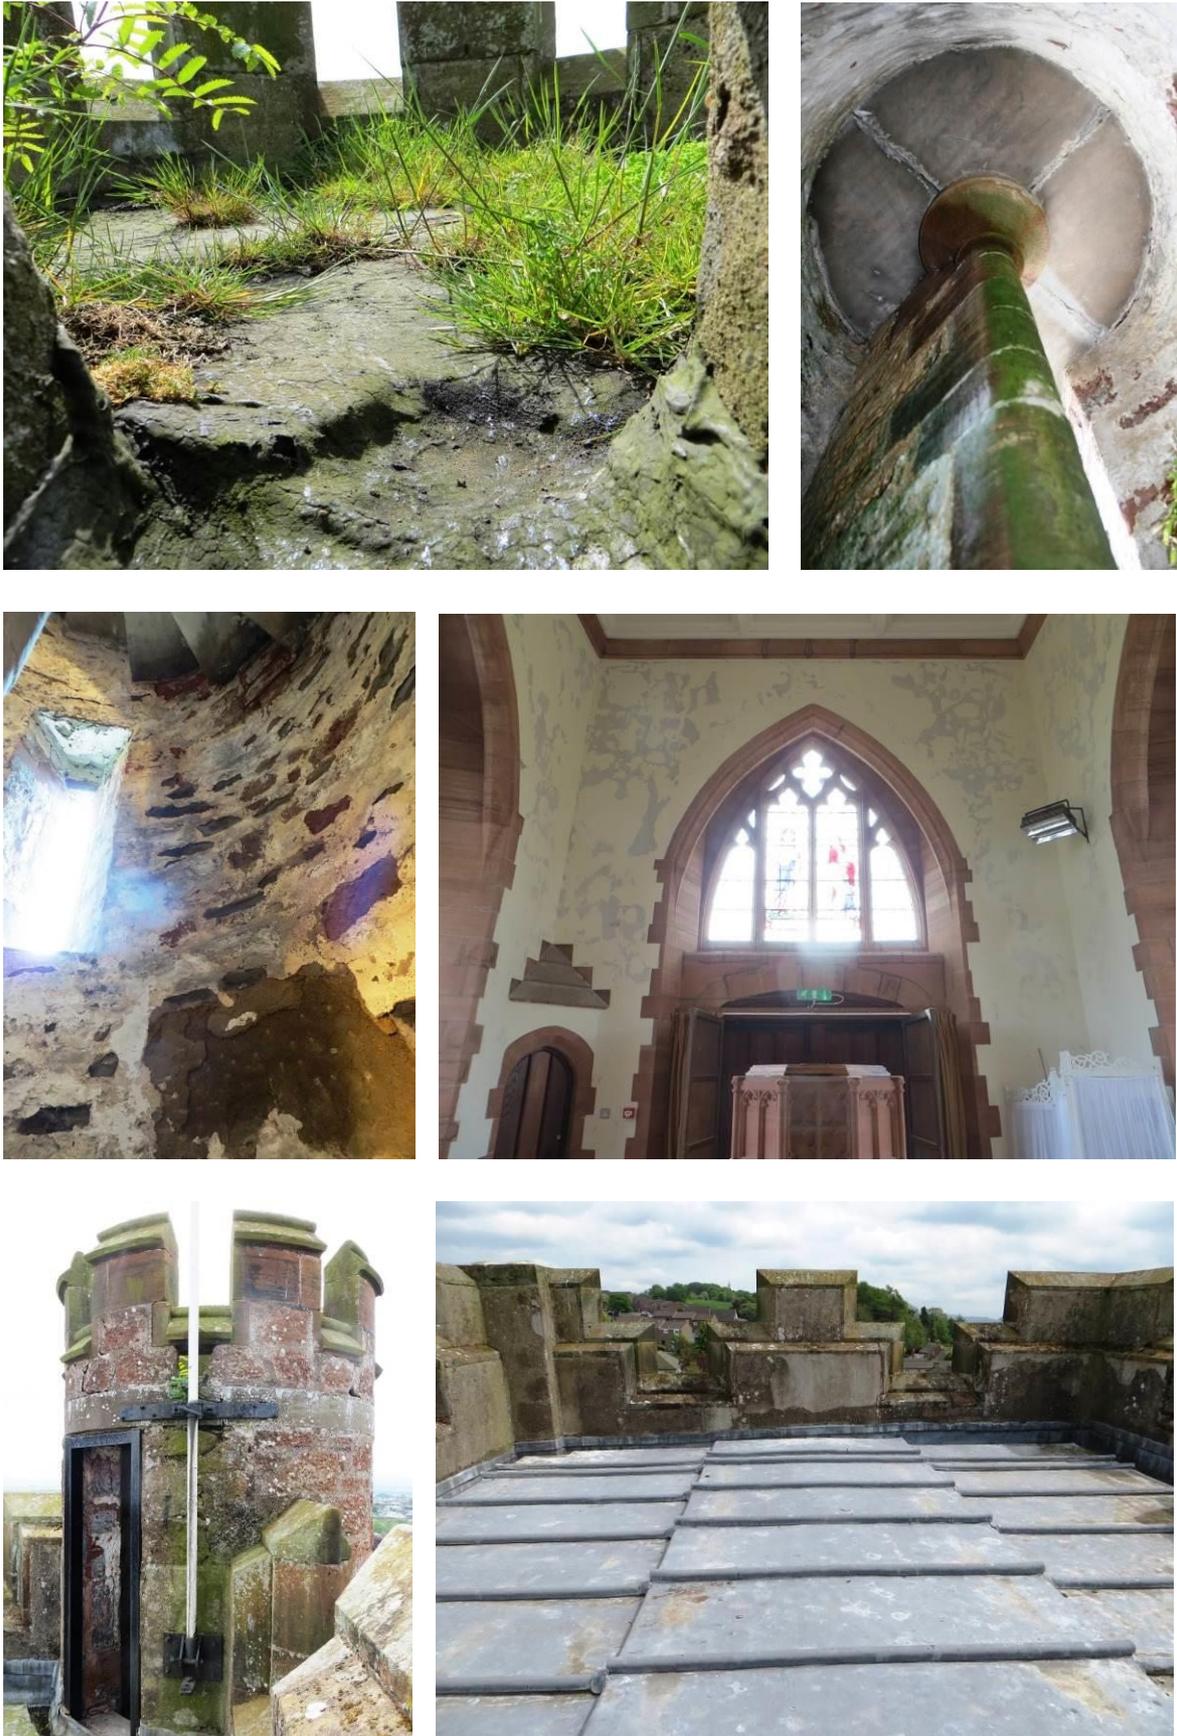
The roof of the stair tower where the roof finish has failed allowing water to penetrate the central spine shown with algae growth; the internal masonry of the tower is spalling in numerous places; the Baptistry has suffered from flaking paint surfaces; the stair tower; the lead roof.
